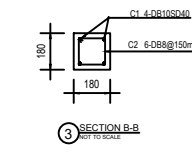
## DETAIL OF GUARDRAIL (REINFORCEMENT)
